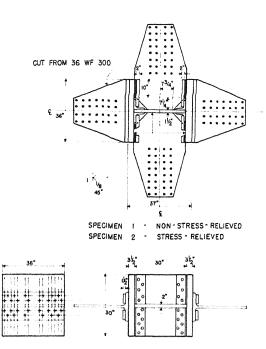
TEST SPECIMEN TYPE I (3rd FLOOR BEAM-COLUMN CONNECTION)
